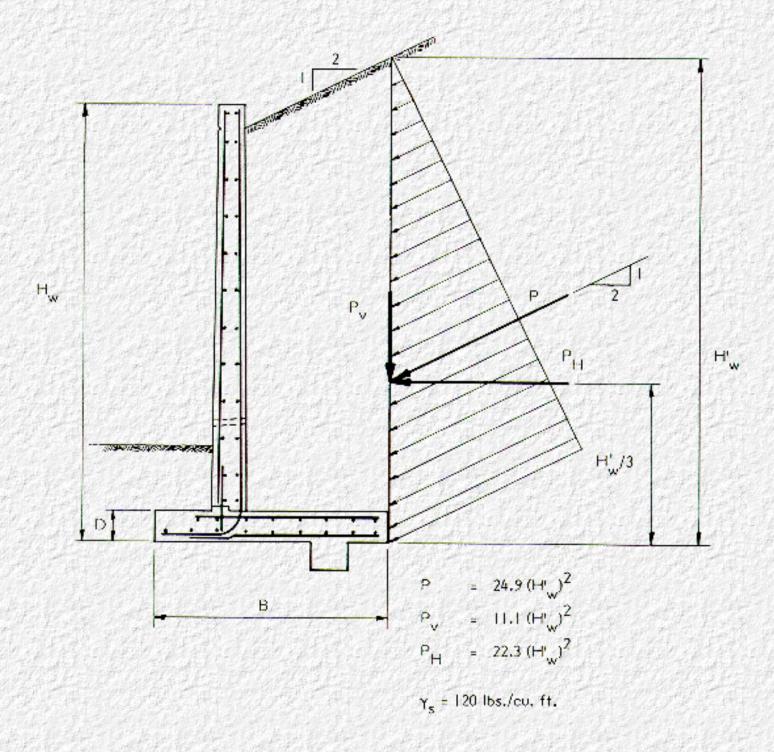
Loading Diagram and Typical Reinforcing Layout for Cantilever
